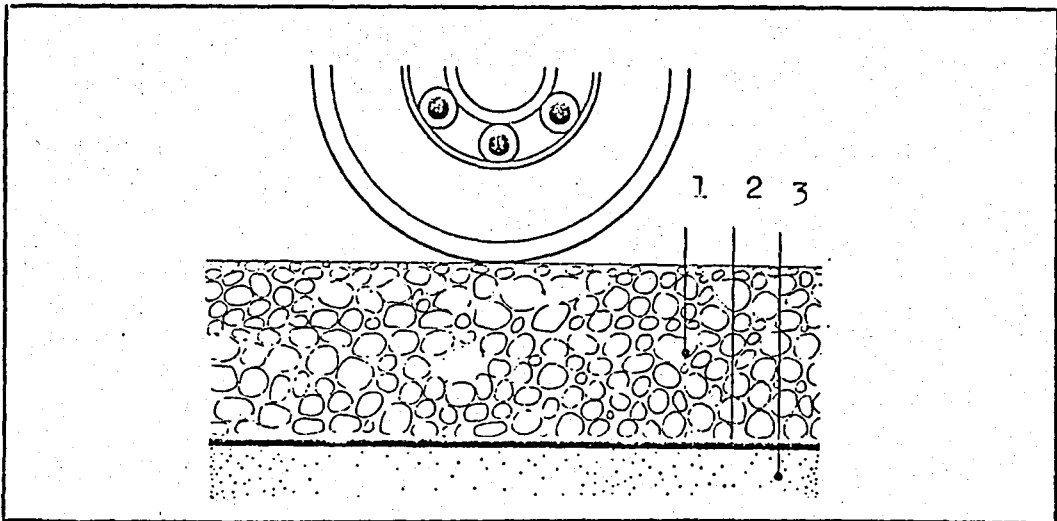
GEOTEXTILE SEPARATES AND SUPPORTS
